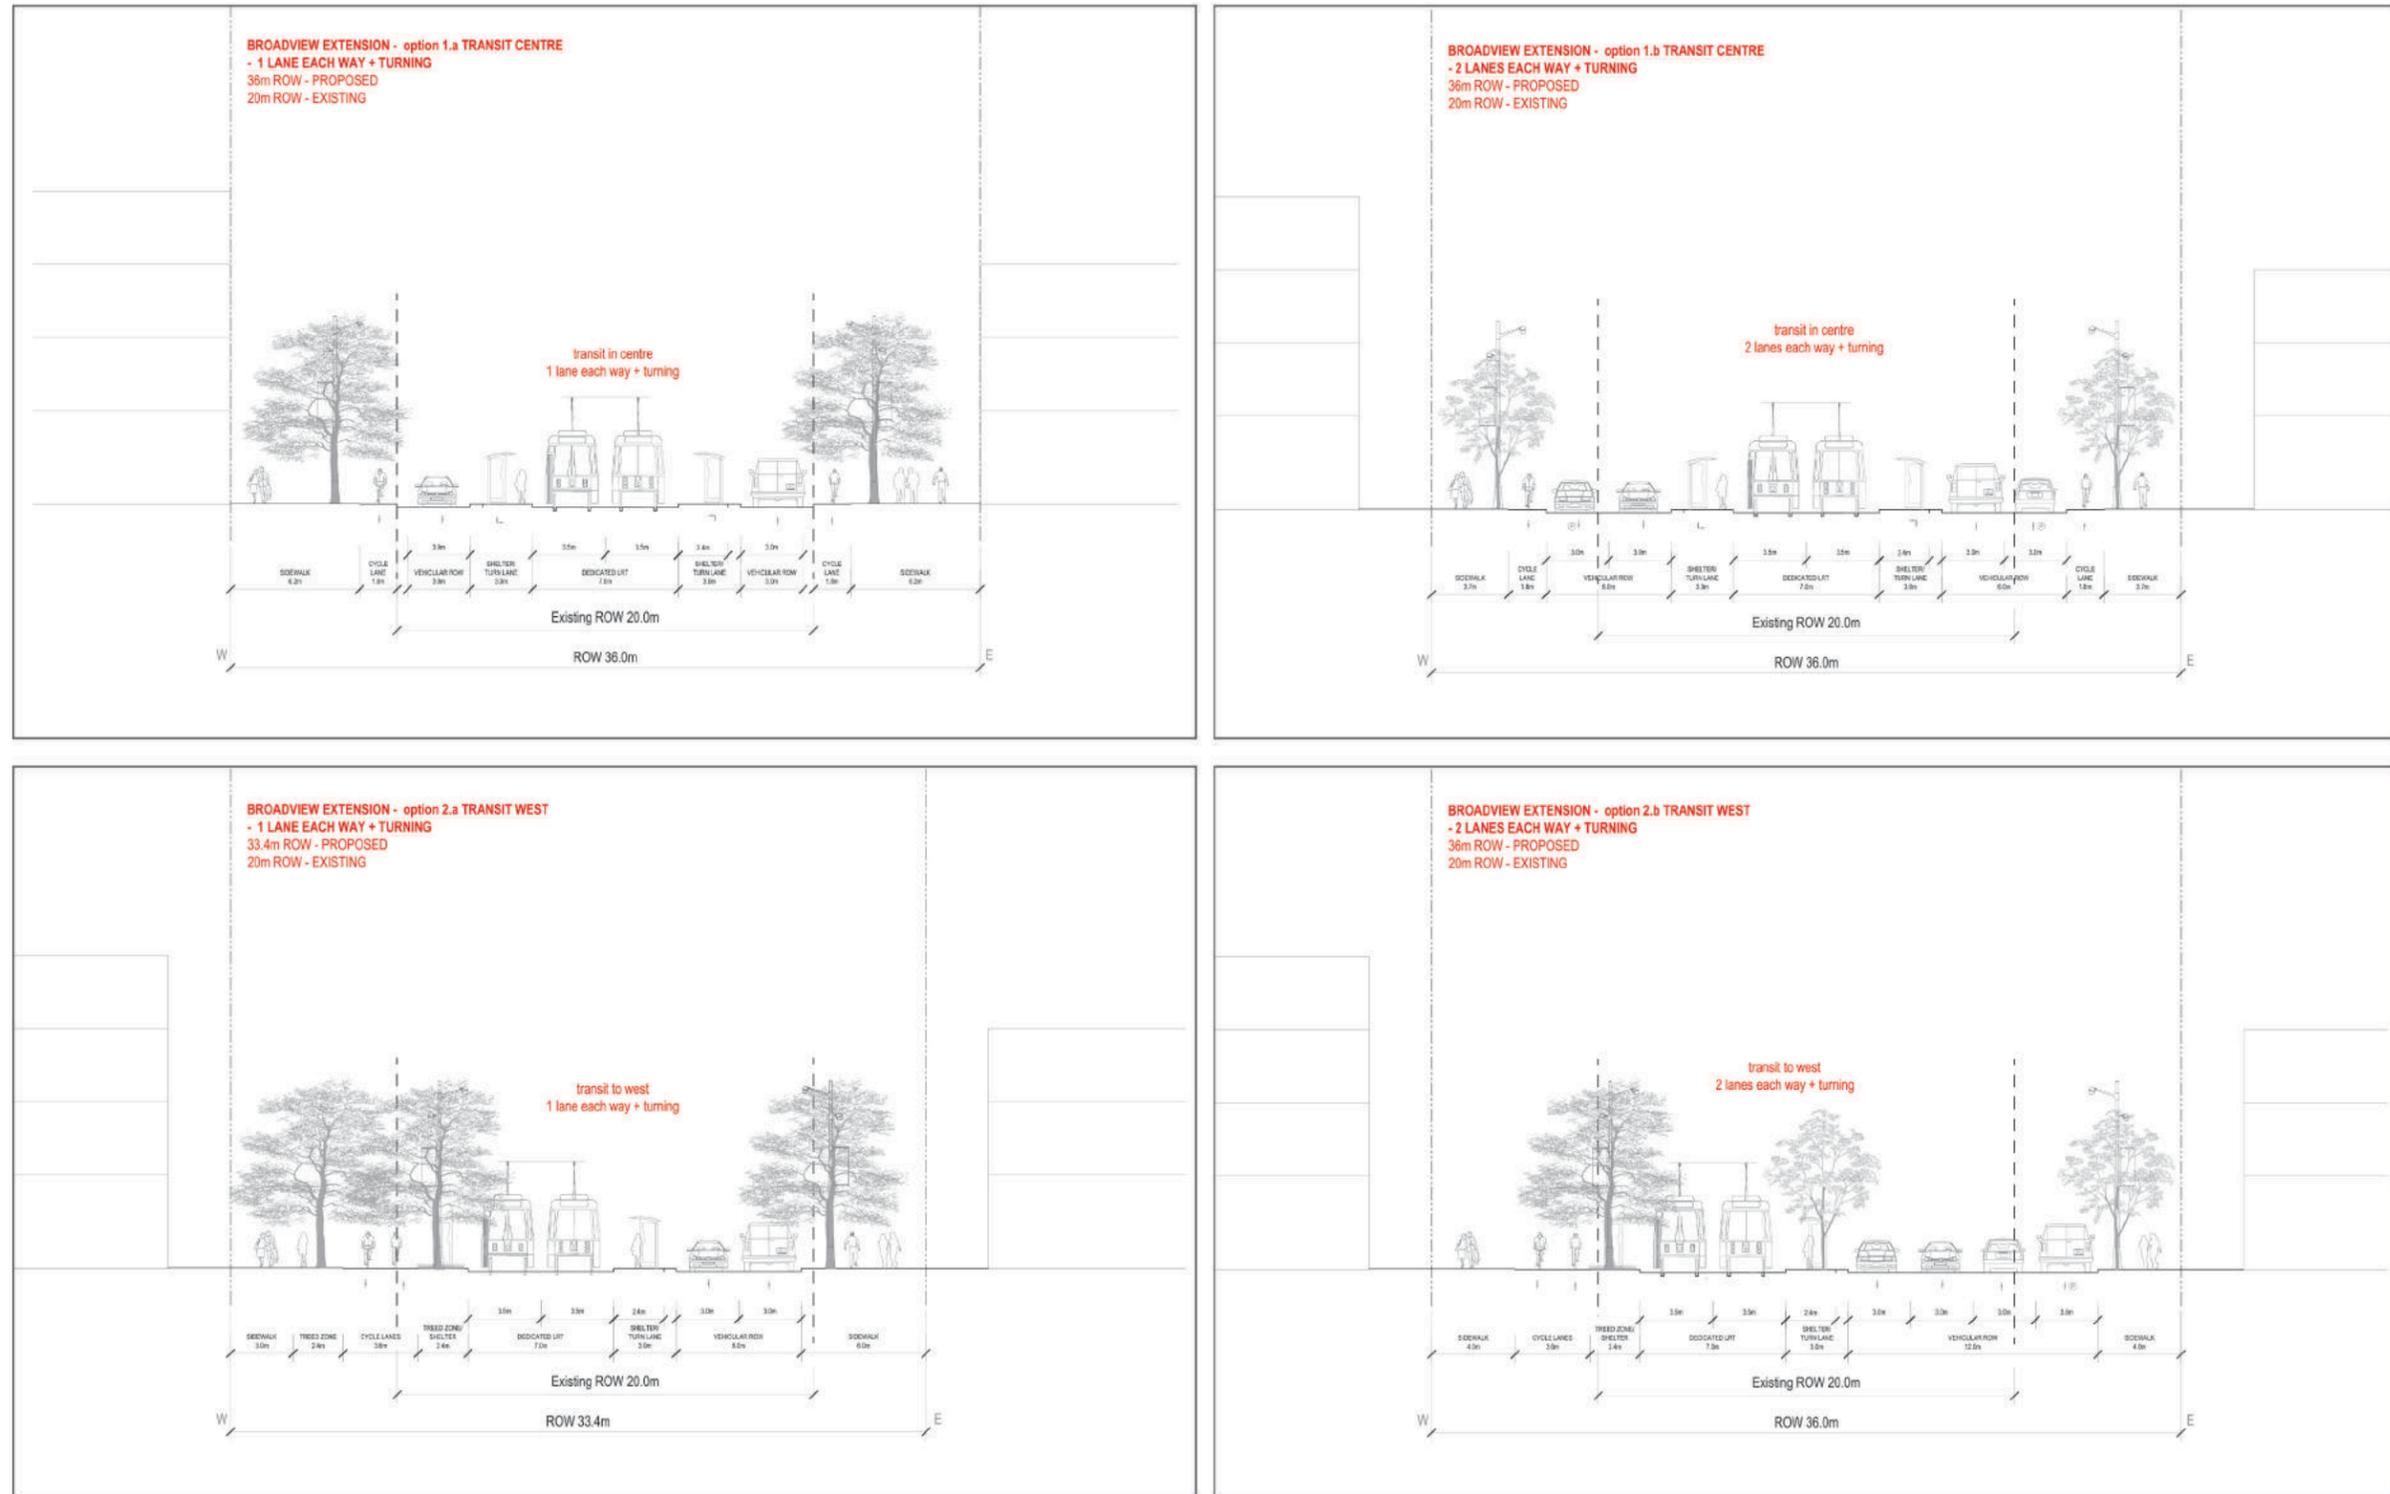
CONCEPTUAL CROSS-SECTION – BROADVIEW AVENUE EXTENSION (SIGNALIZED INTERSECTIONS/TTC STOPS) (35 M RIGHT-OF-WAY)
